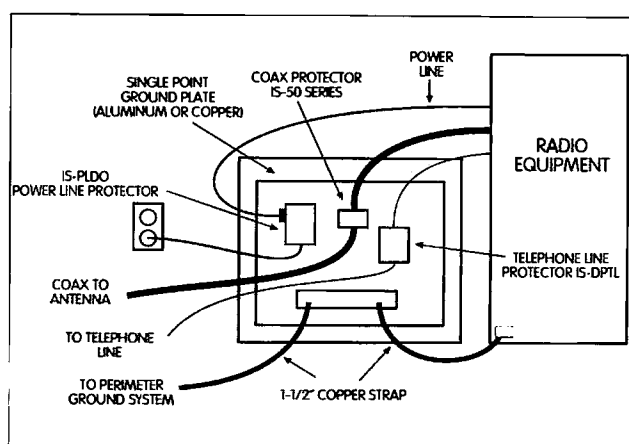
Typical single point ground installation for rack-mounted equipment.
